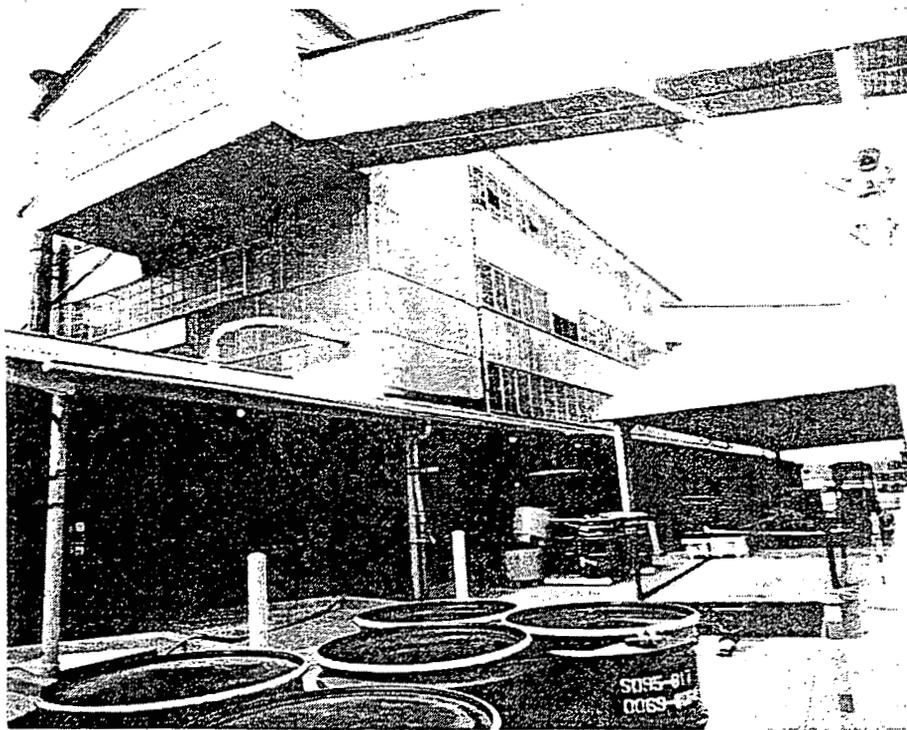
Ground-Level View of Building 1A from NE Corner
